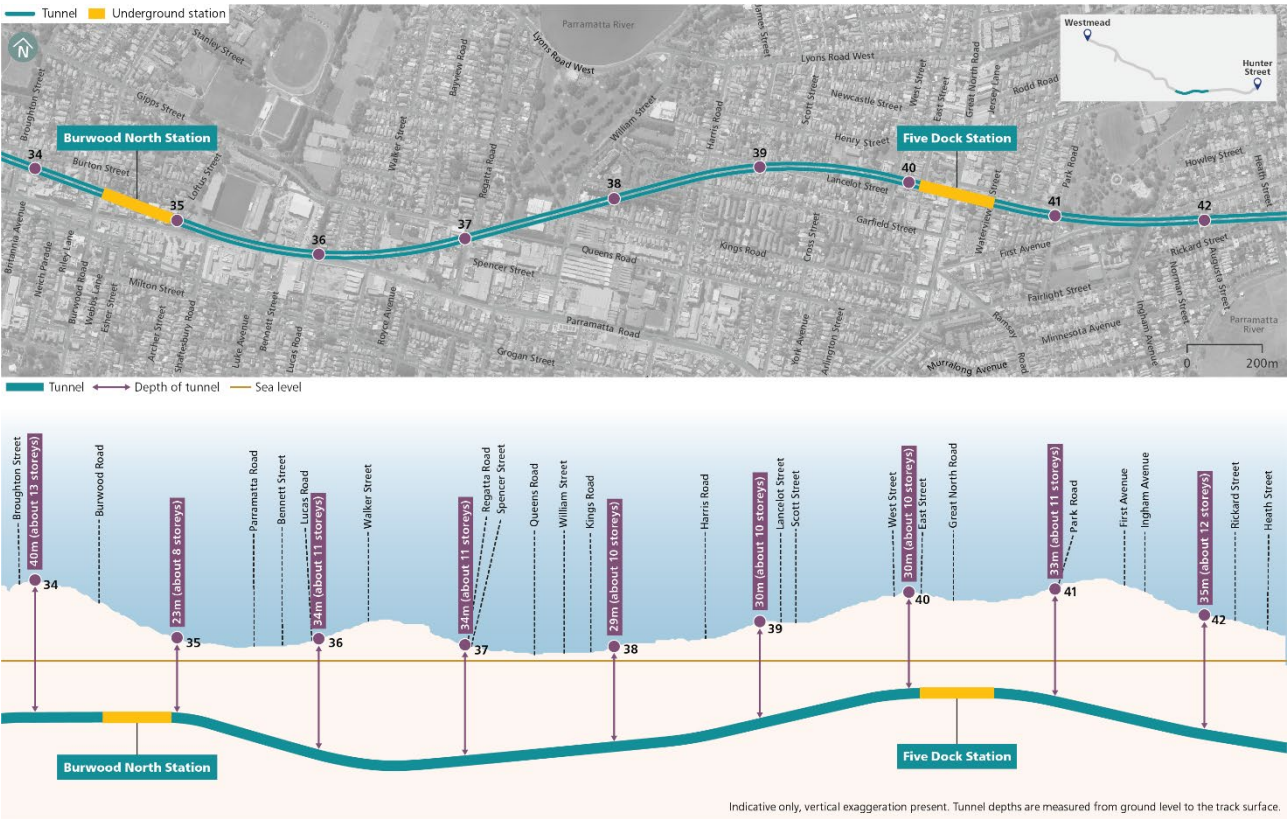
Indicative alignment plan and long section (5 of 8)
